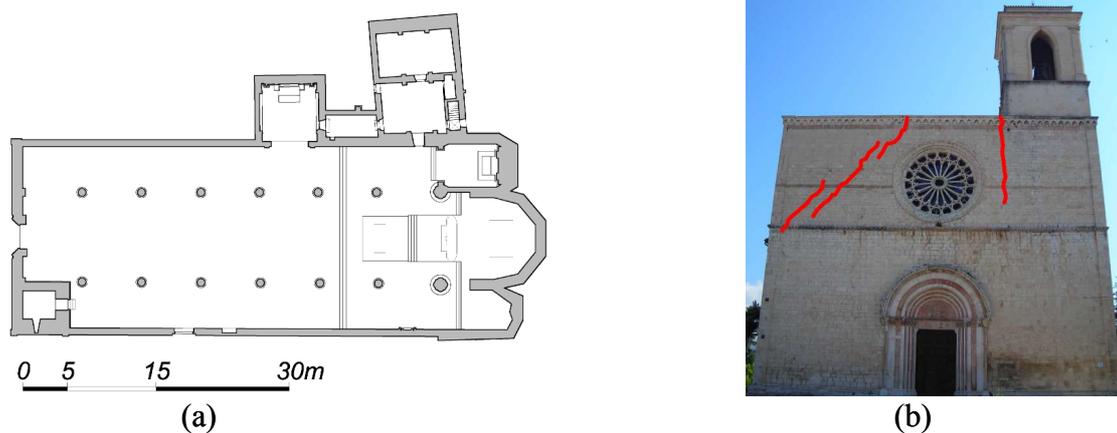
St. Silvestro church: plan (a); damage at façade (b)
